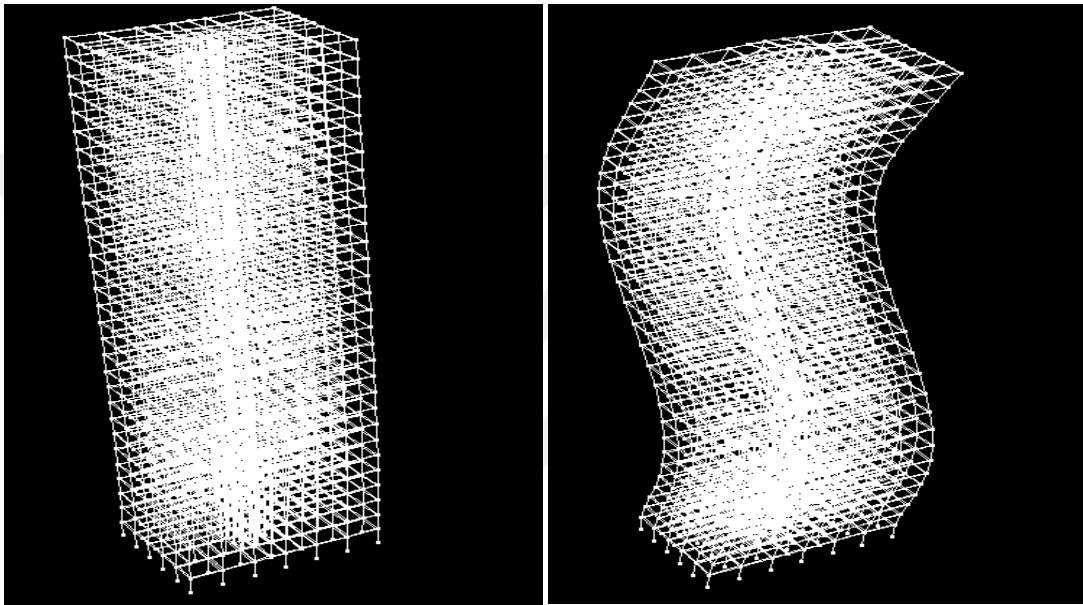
2nd & 5th Mode shapes of core wall building
